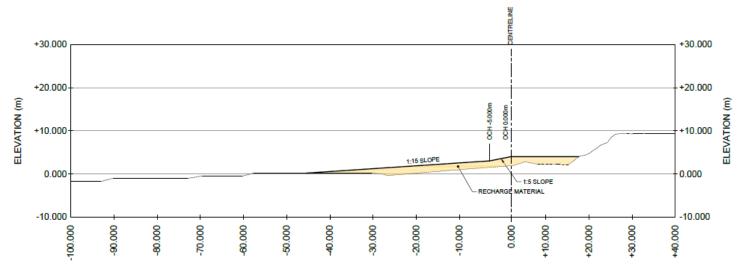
Typical cross section at Ostend - Element 2 Villages
